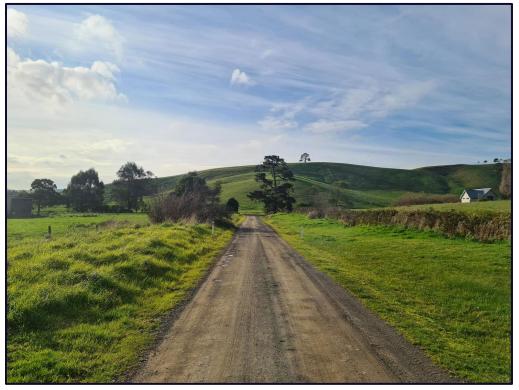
Site photograph looking north along Church Road (subject site to the left).
